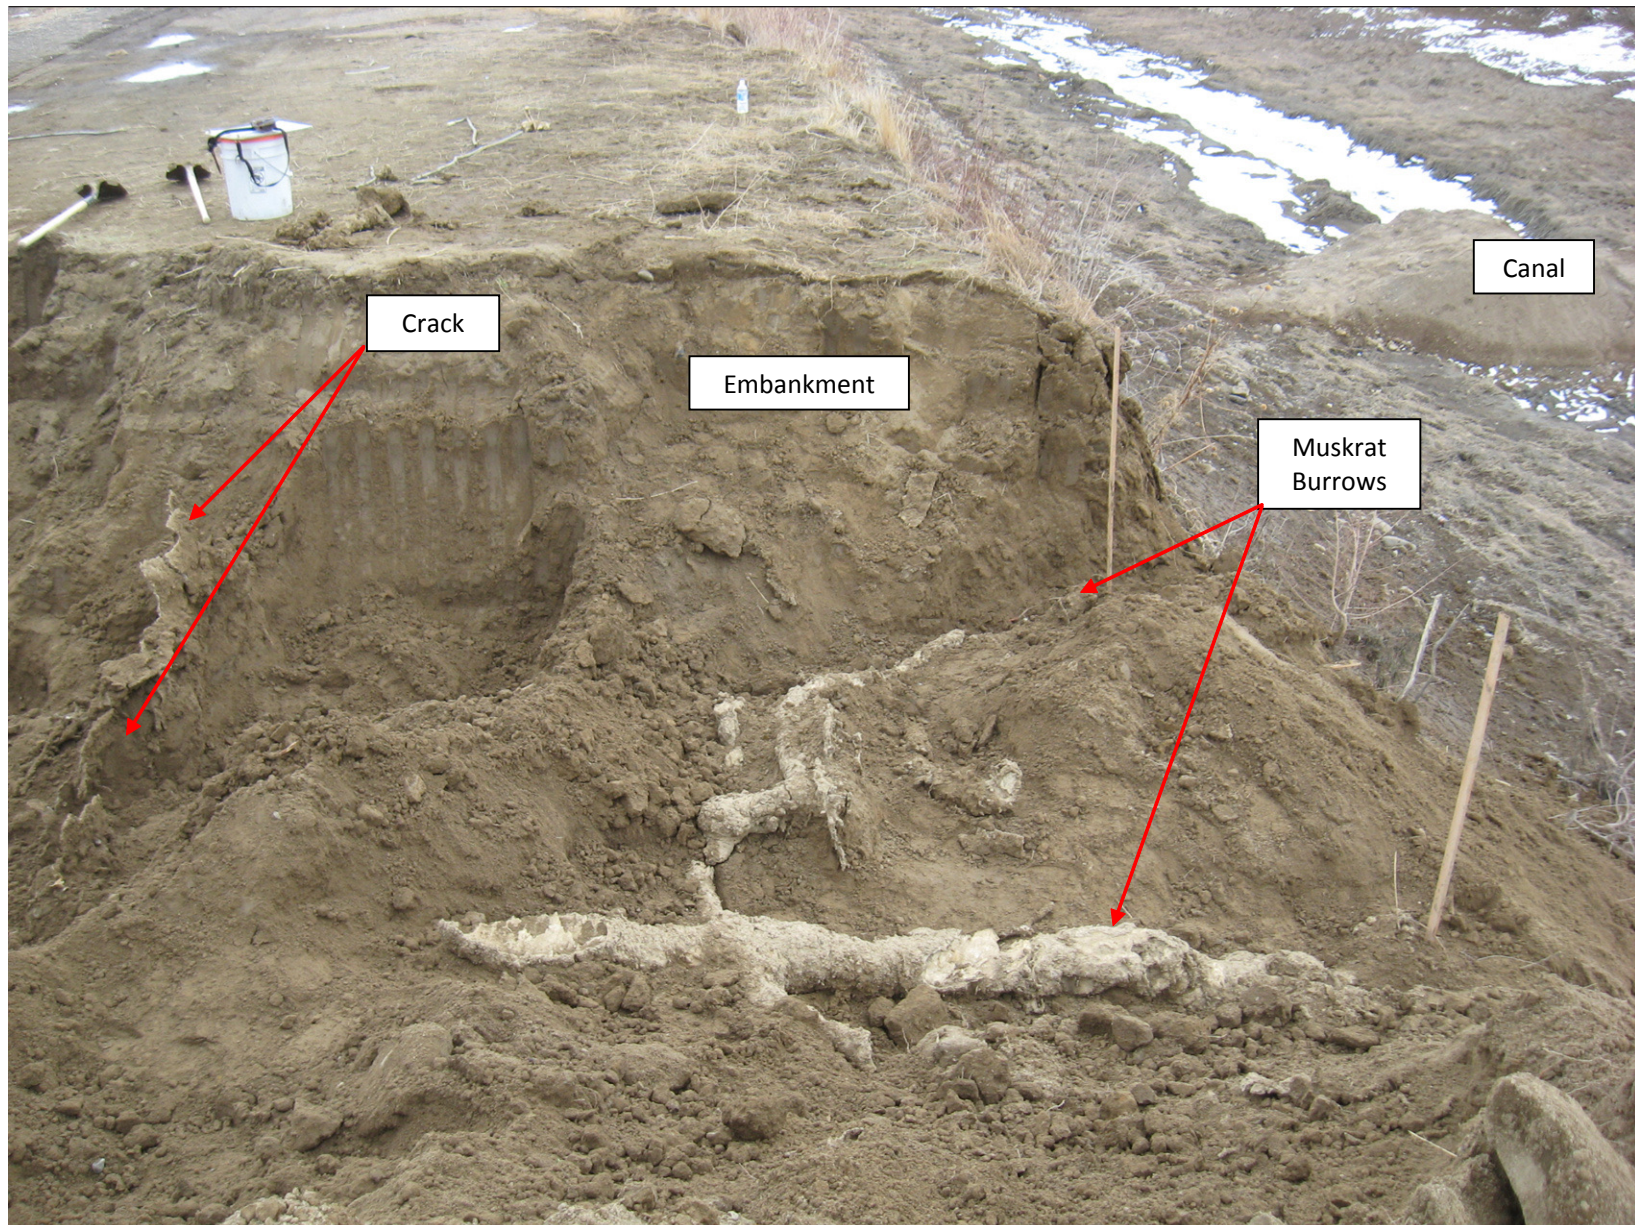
View of main muskrat burrows entering from canal. Note one of several cracks parallel embankment. Photo by M. McCulla, 01-23-2008.
